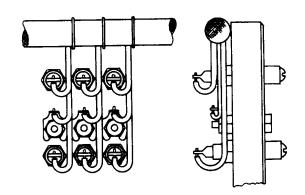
Fuse Posts — No. 5 and Similar Types — No. 14 Gauge and Smaller Wires
